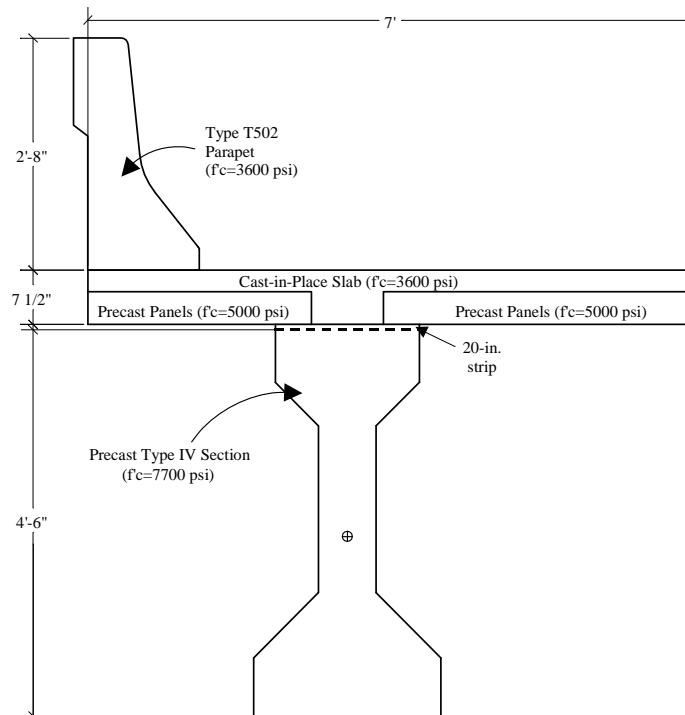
Composite Section for Exterior Girder - Slaughter Creek Bridge
